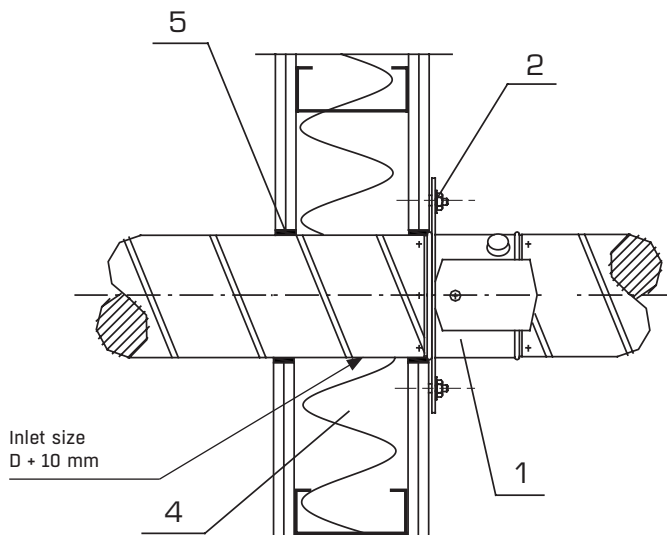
Installation of fire damper into lightweight plasterboard building elements (gypsum board or similar), wall thickness  $\geq 116$  mm. The blade shaft can be placed in any position.
